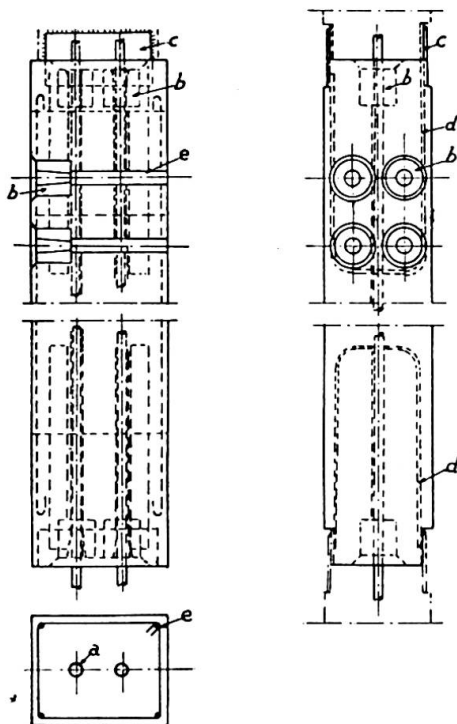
(left). Detail « A » of figure 6 (plan and side elevation).
